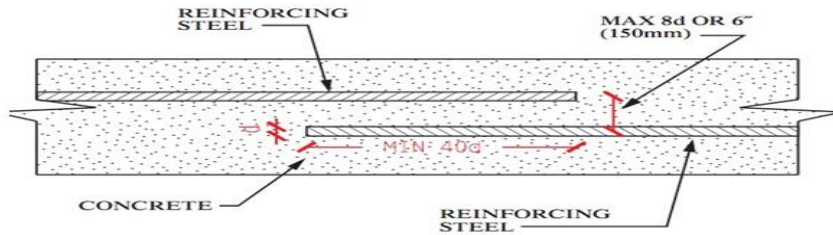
Non-contact lap splicing reinforcement bar [2]
